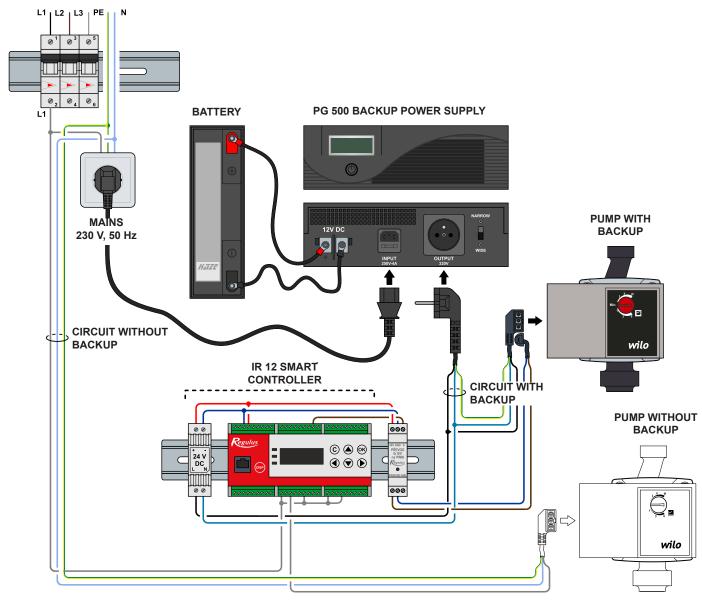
DETAILED PIC. SHÓWING TERMÍNAL BOARDS MARKING AND WIRING
